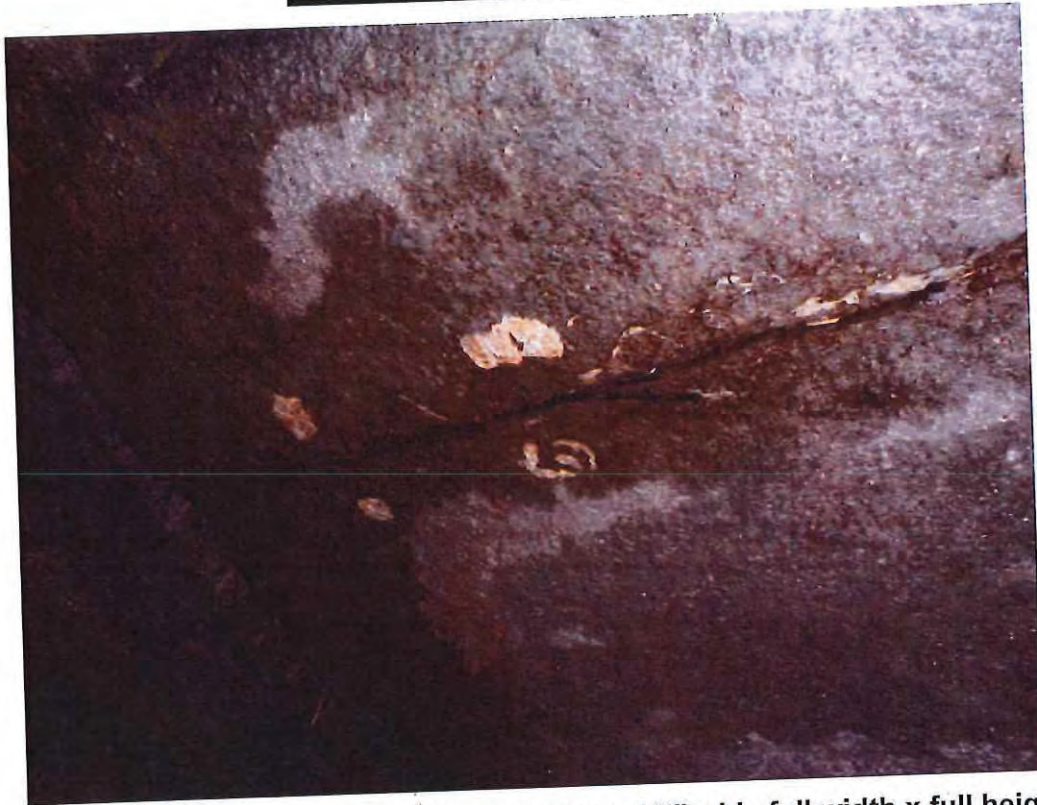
Seventh granite slab from the east: 1/4" wide full width x full height crack at midspan.
